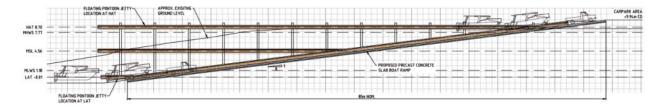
Elevation – Alternative Location – Revetment Side Slope Option
